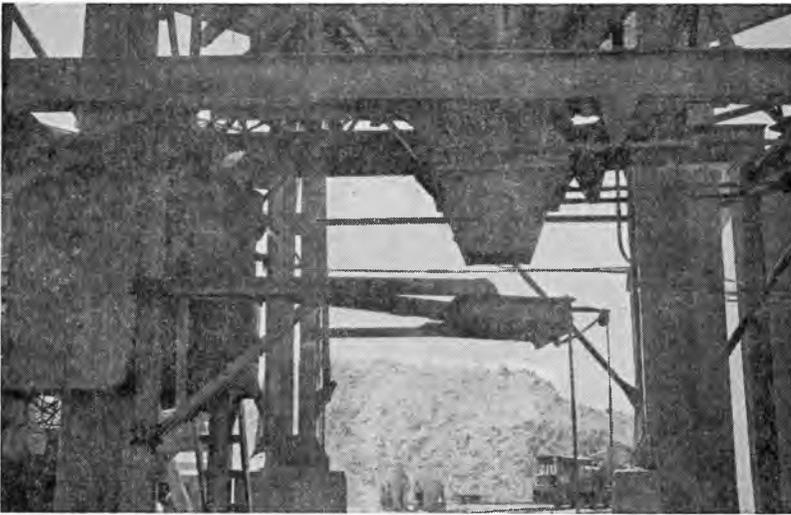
Sampling tray which is swung under concrete hopper to obtain two cubic feet of concrete for tests.
